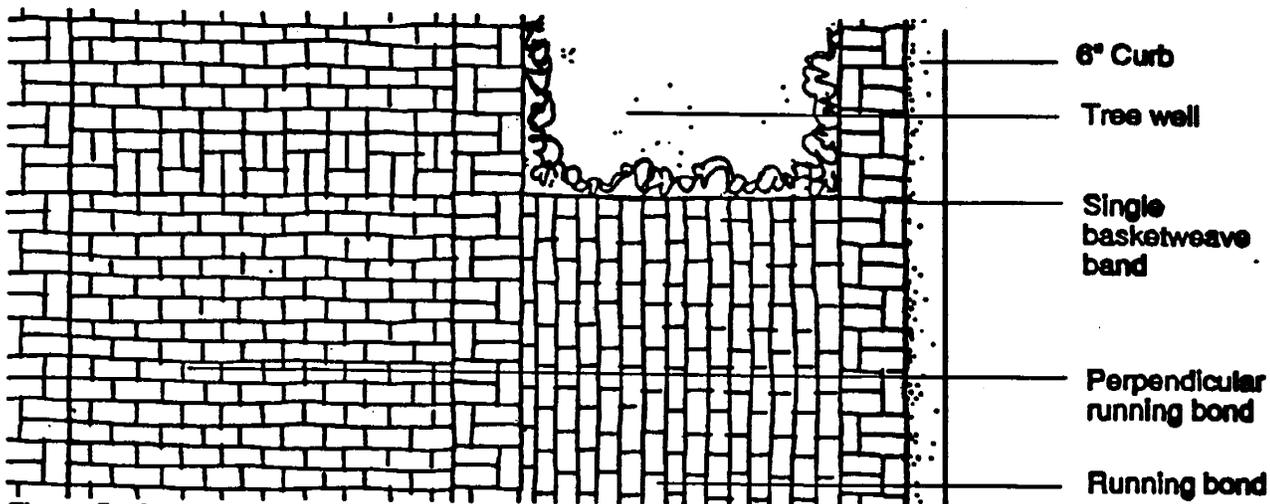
Jamieson Avenue Standard Sidewalk Paving
